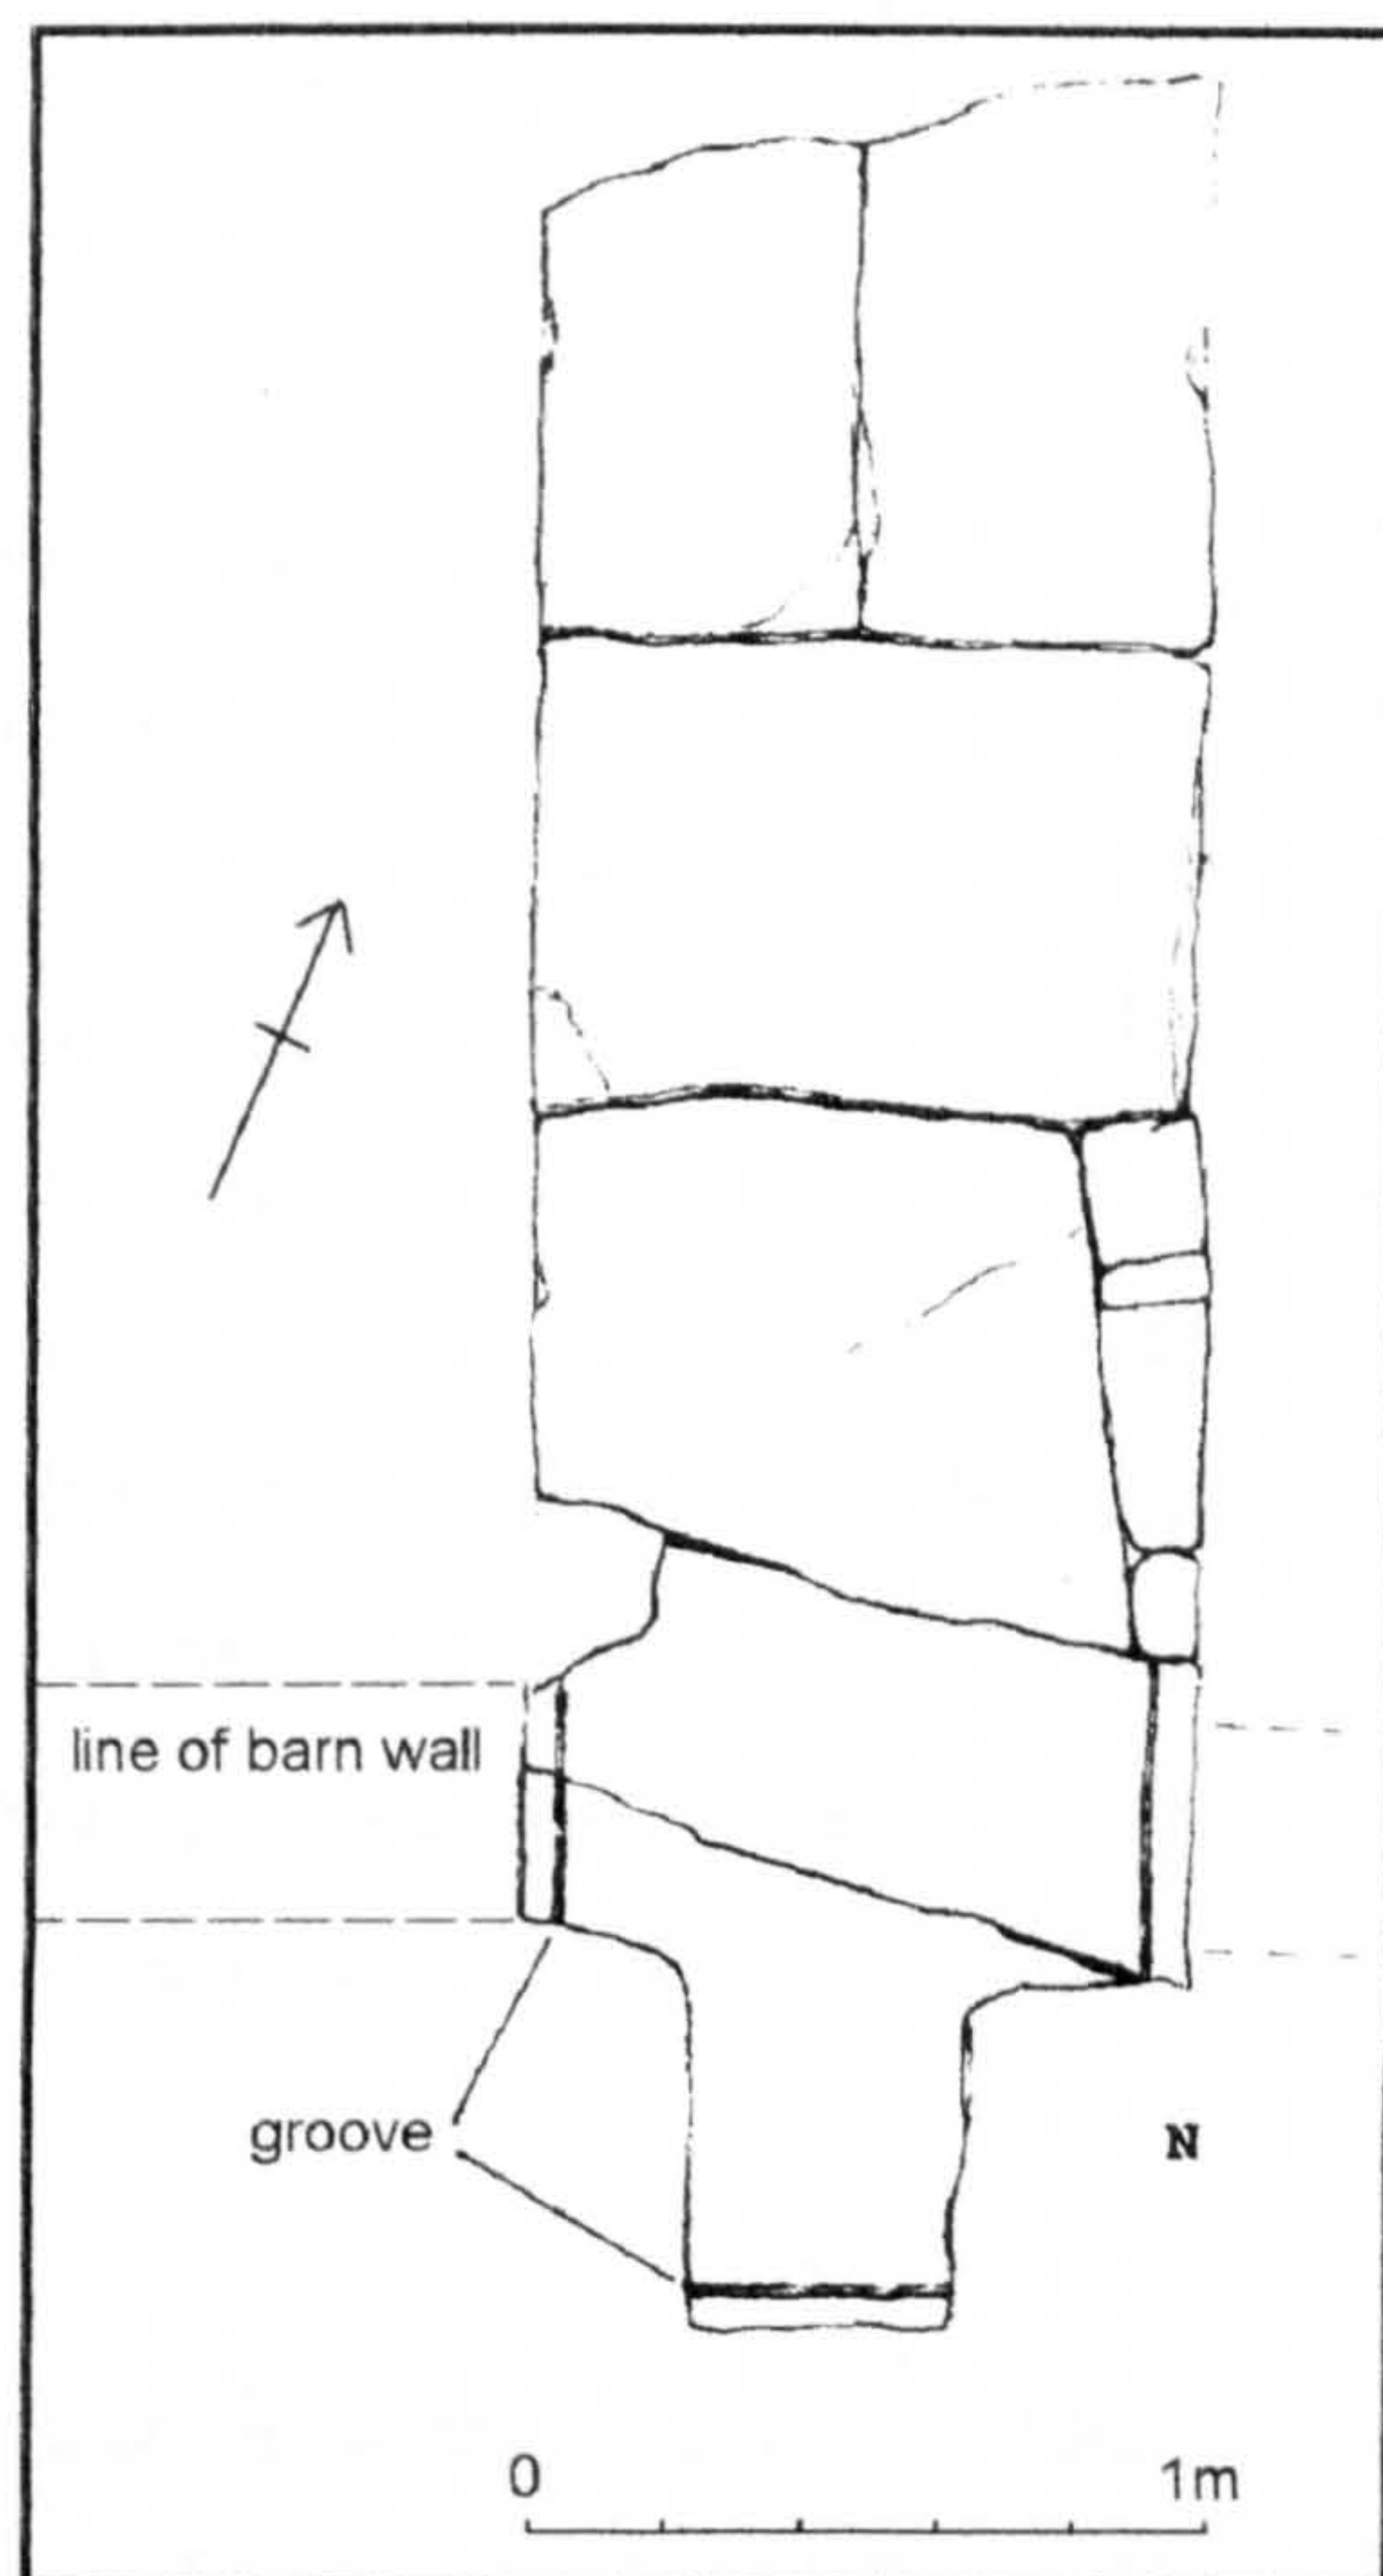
Plan of stone lining of leat under mill building at Woolaston Grange.
